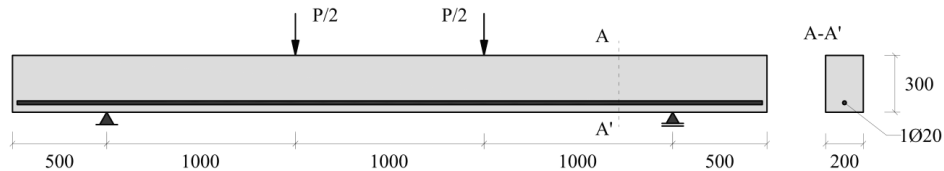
Test setup and cross-section of the full-scale beams. Dimensions in mm.
